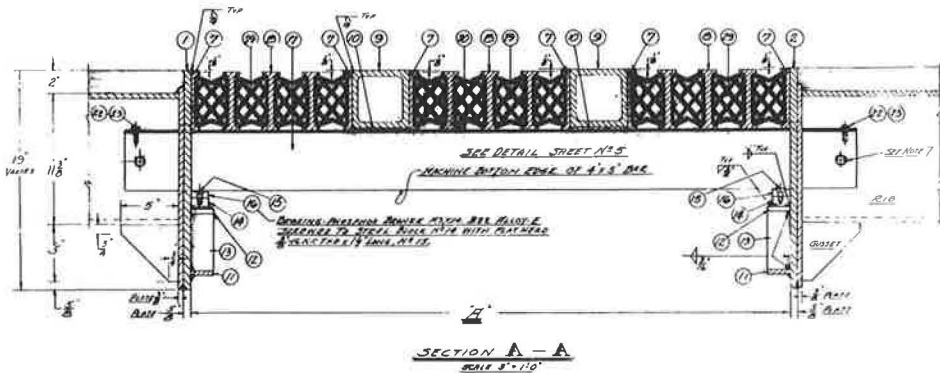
Modular sealing system incorporating 18-in. movement capability for Halifax Narrows Bridge.
